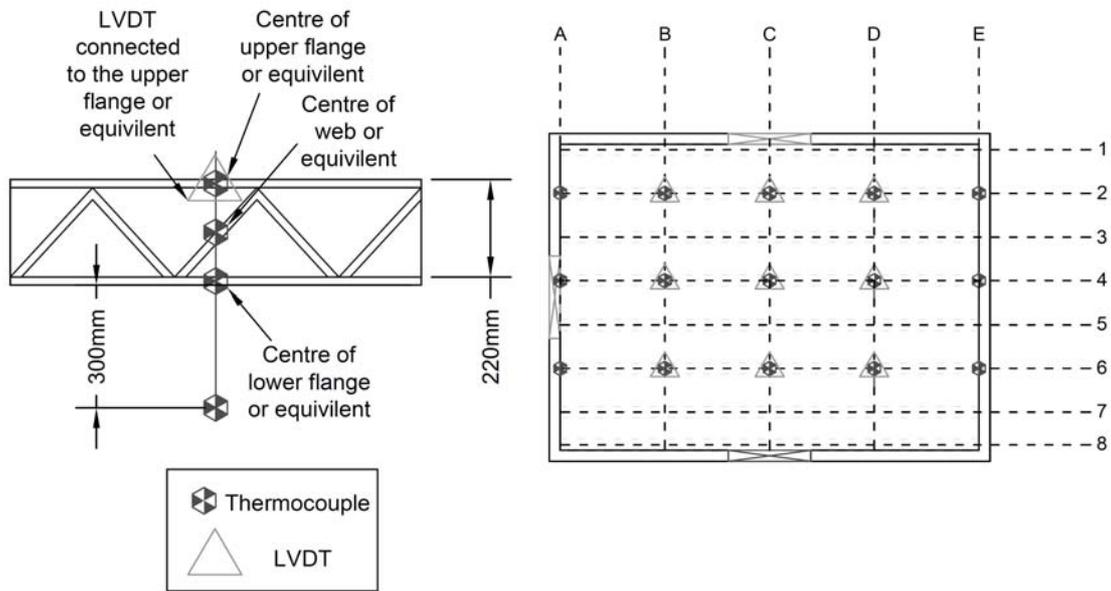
Instrumentation plan: (a) placement of thermocouples; (b) plan of compartment
